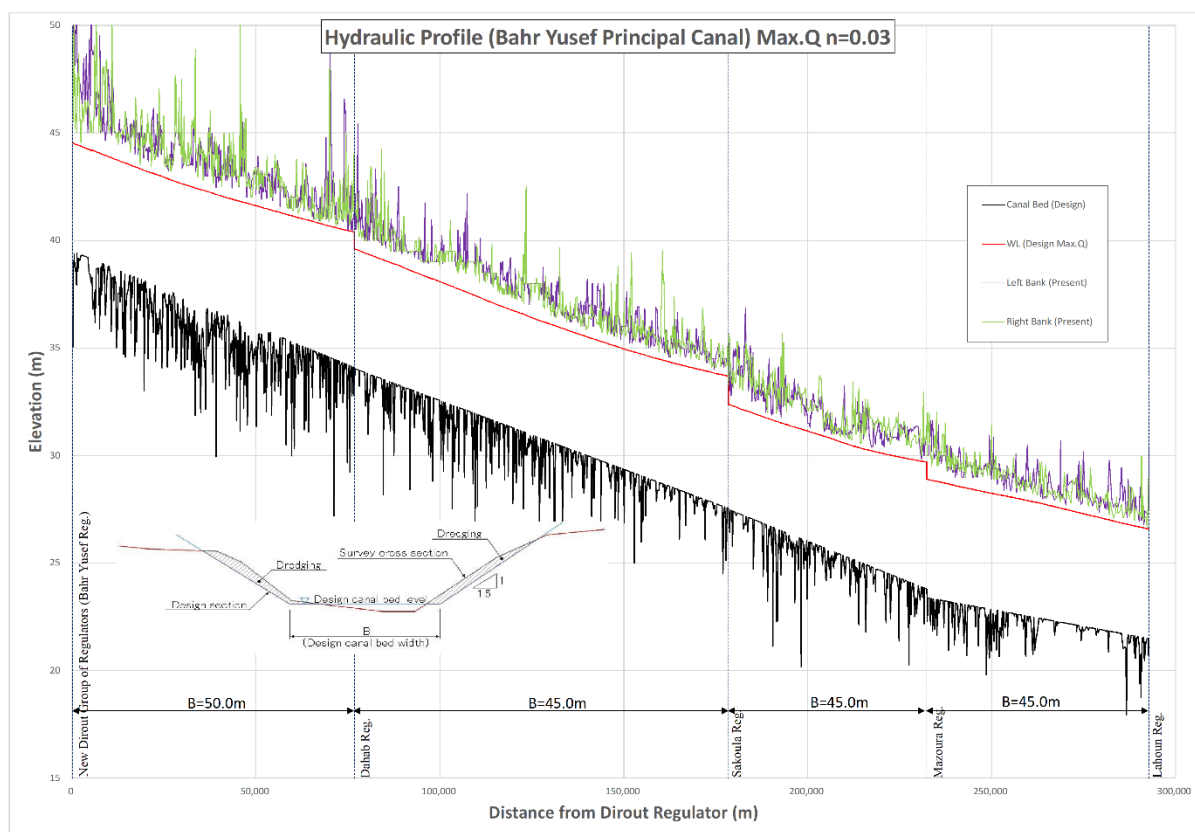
Hydraulic Longitudinal Section of Bahr Yusef Principal Canal (Maintenance Plan: Max.Q)
